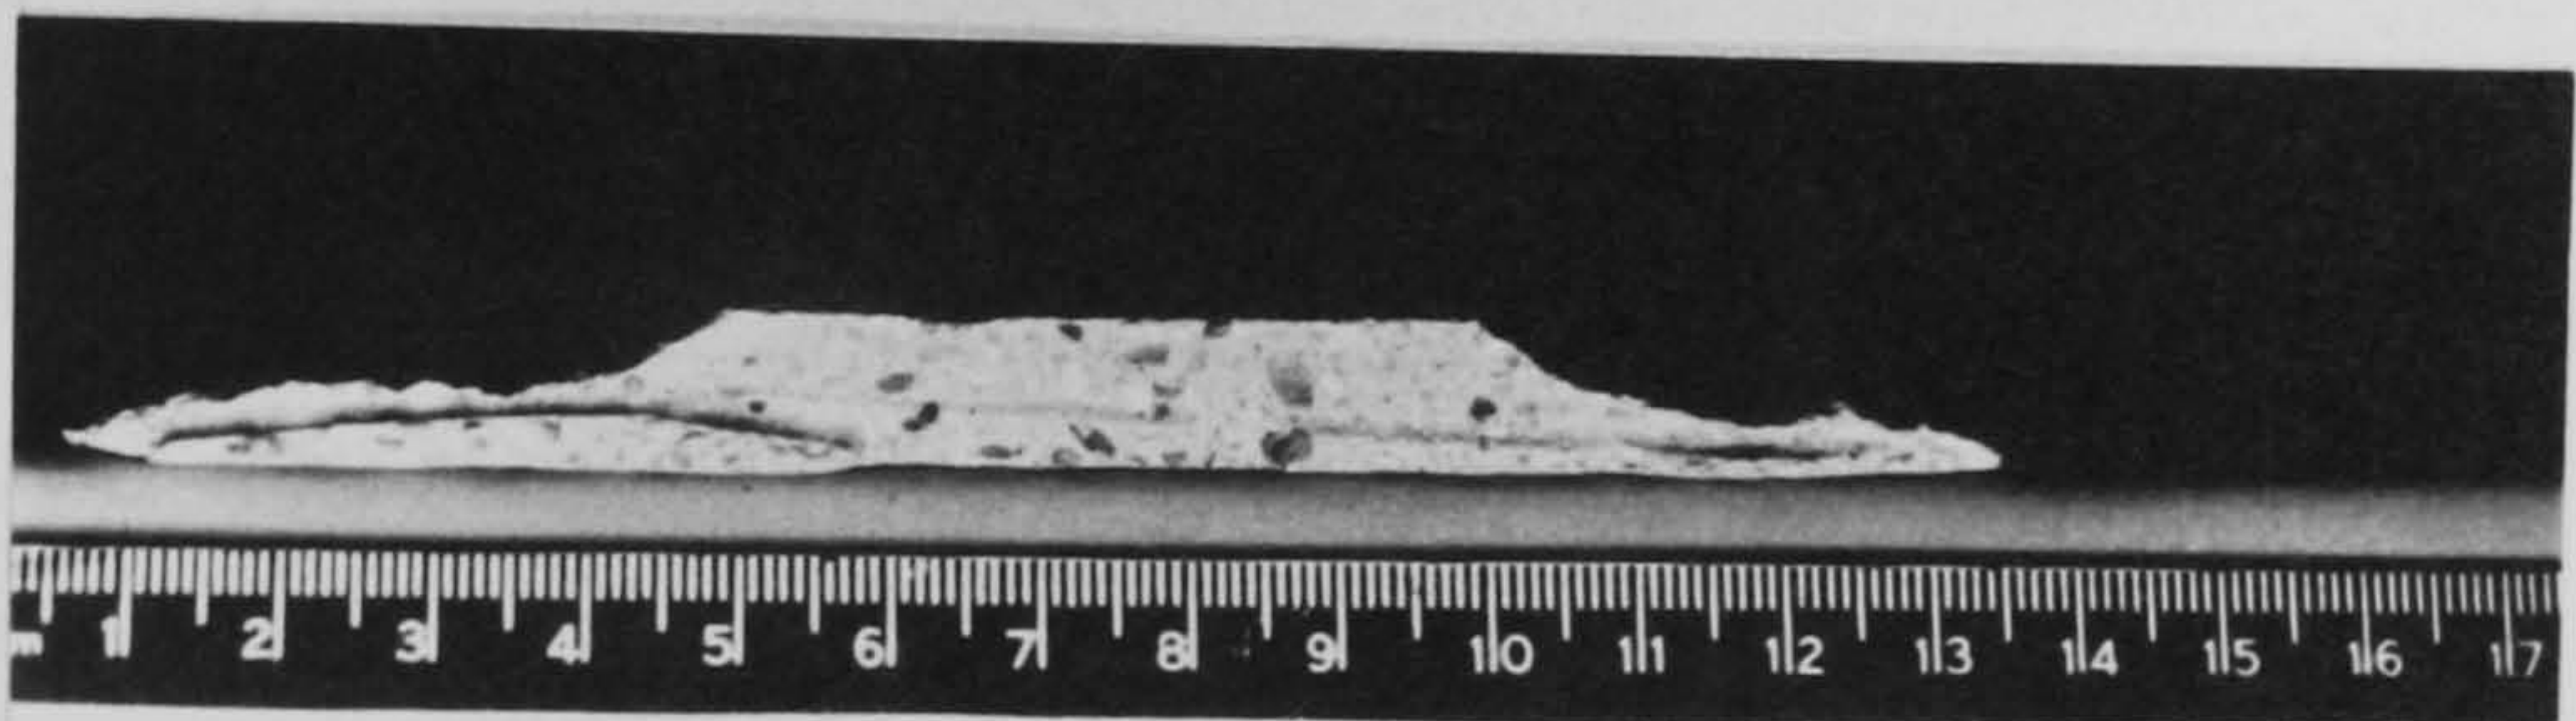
& 6.40 SPECIMENS AFTER TEST
